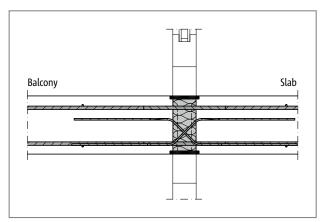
Schöck Isokorb® T type D: Two-way spanning
